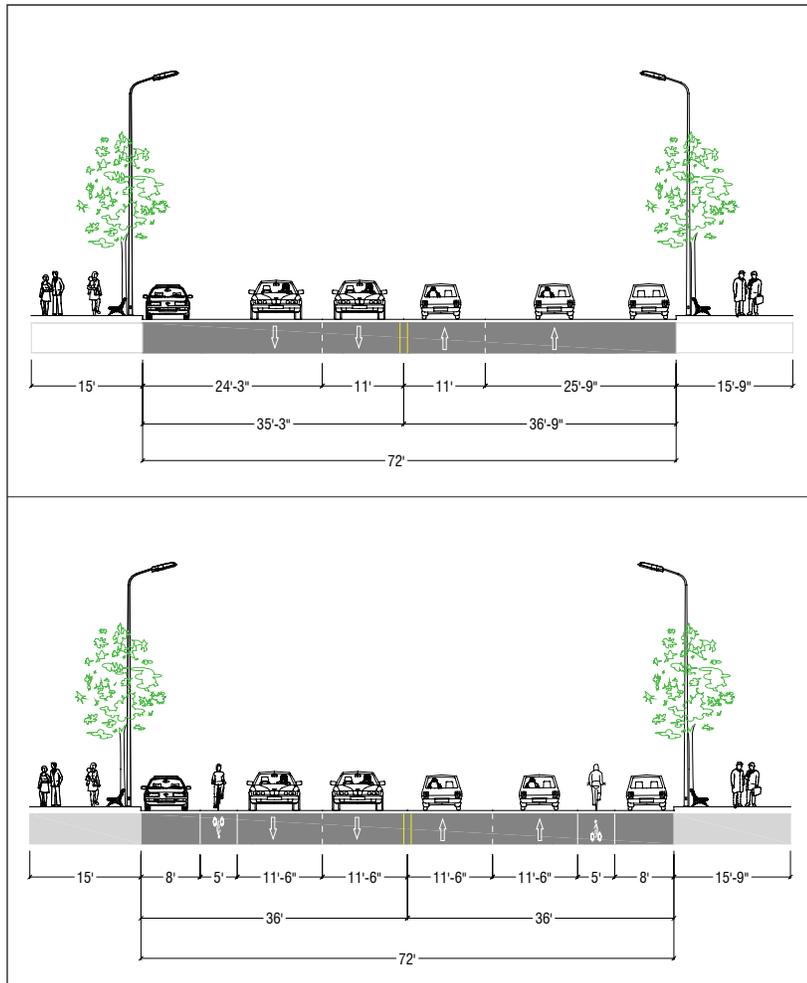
Bruckner Boulevard between Lincoln Avenue and Alexander Avenue, existing and recommended cross section (facing west)
